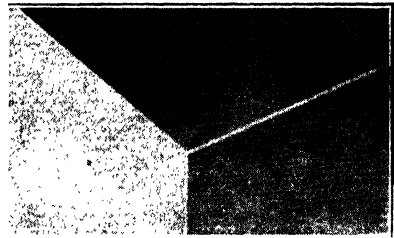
Corner of Room Plastered on Insulating Plaster Base
